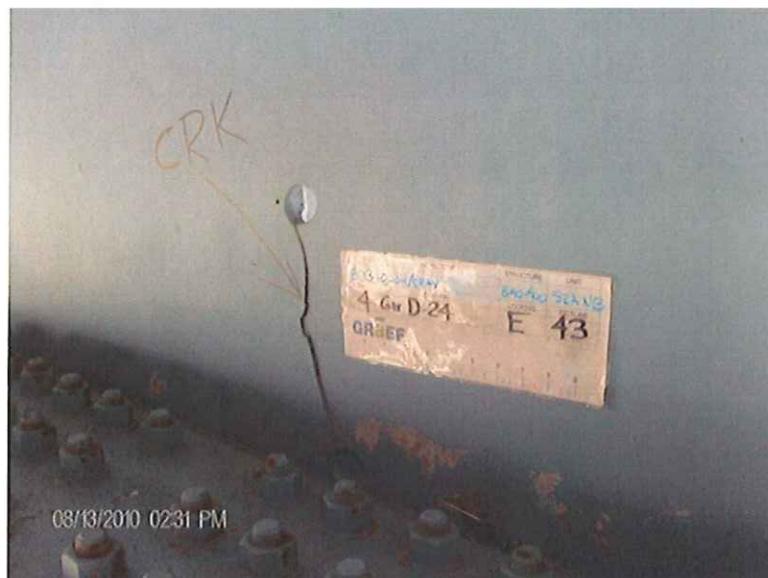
Large existing crack through web of girder arrested by mouseholes and bottom flange splice plates.
